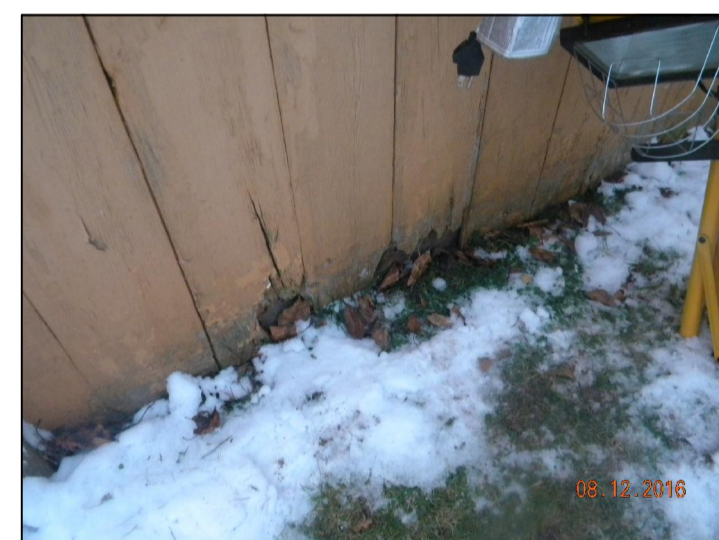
WOOD SIDING DAMAGED WHERE IN TOUCH WITH GROUND
